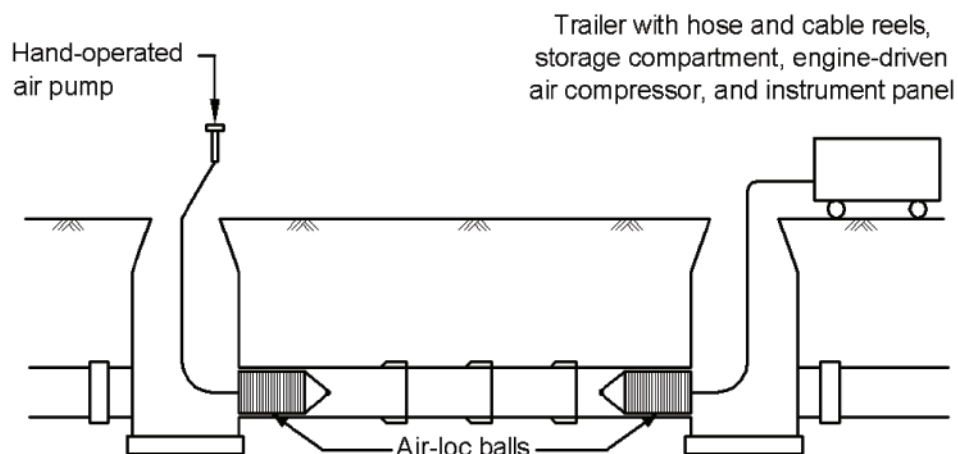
Typical arrangement for low pressure air testing of sewer pipeline
